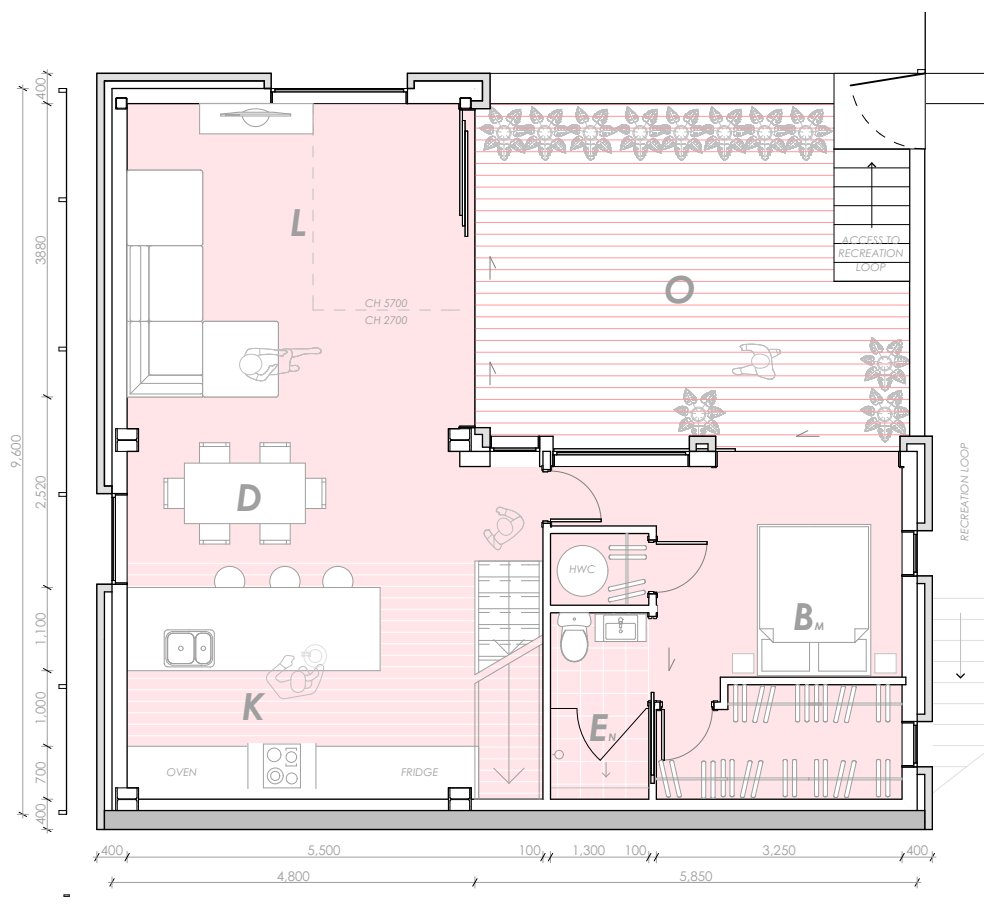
| Living floor plan (3rd floor) 1:100.
